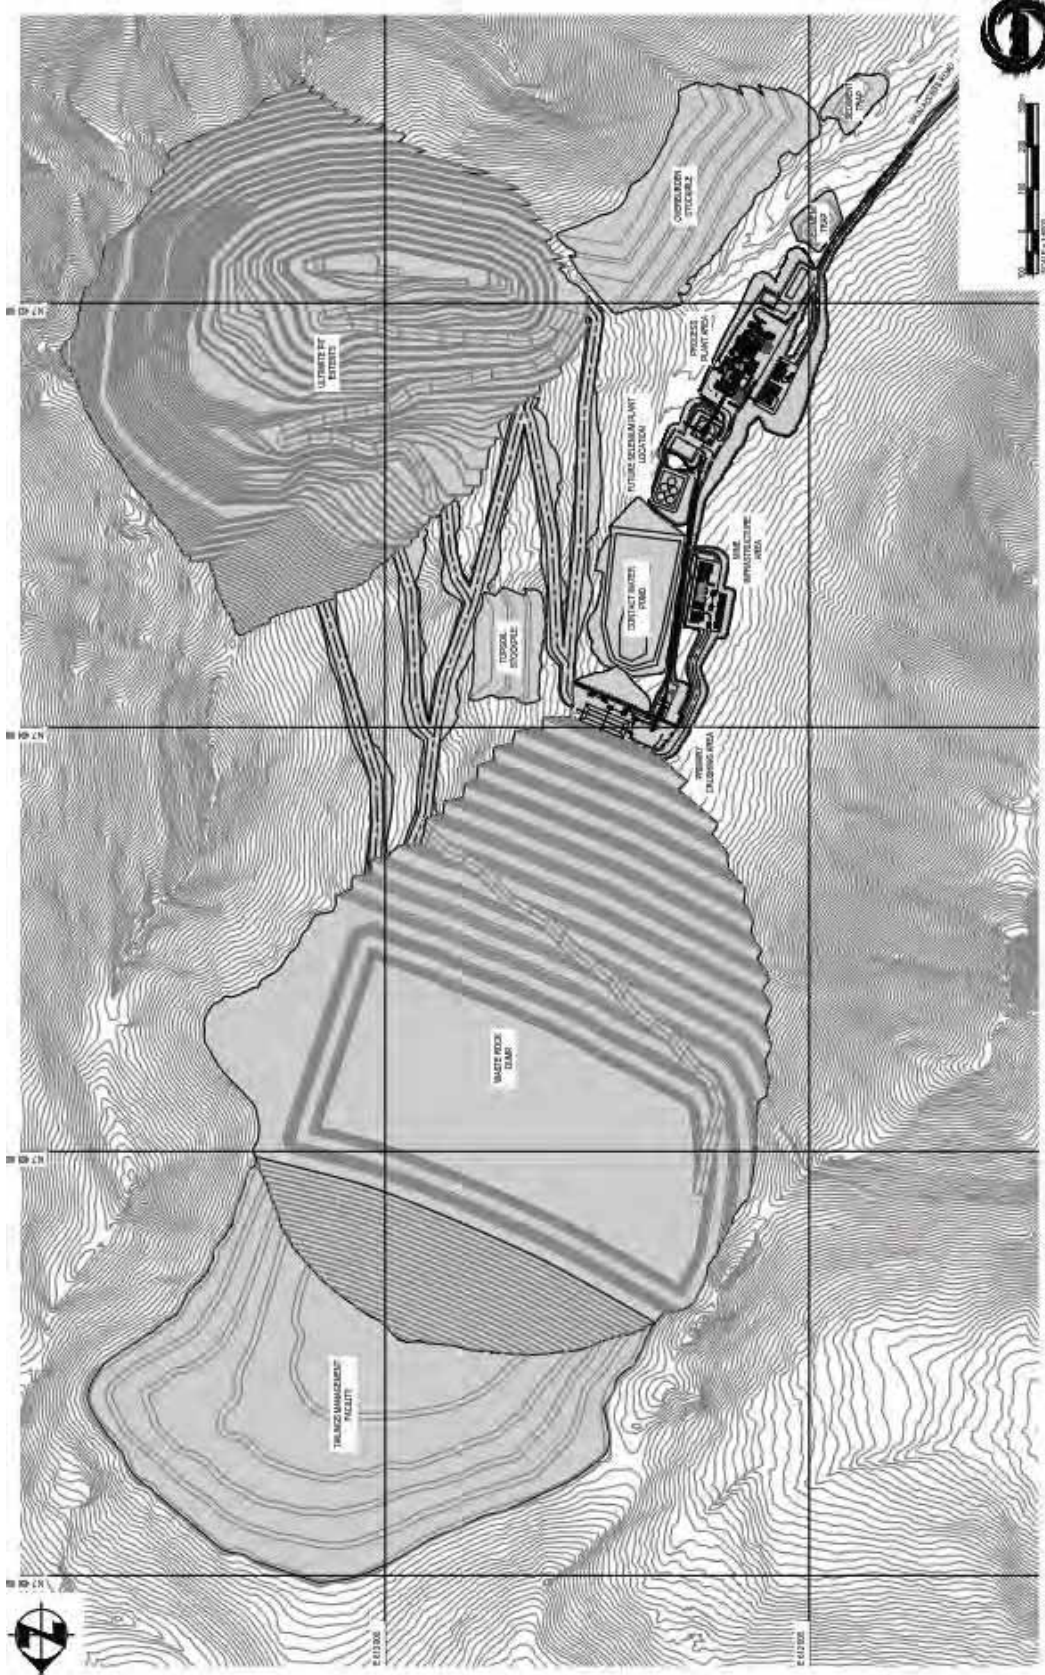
Proposed Site Layout (Ausenco, 2020)
